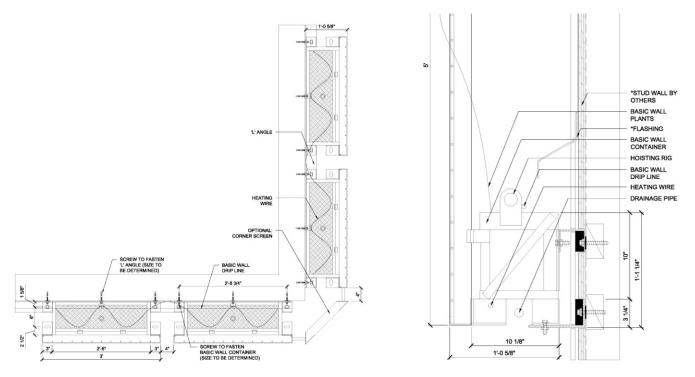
Container plan and section details (<u>www.gsky.com</u>)
